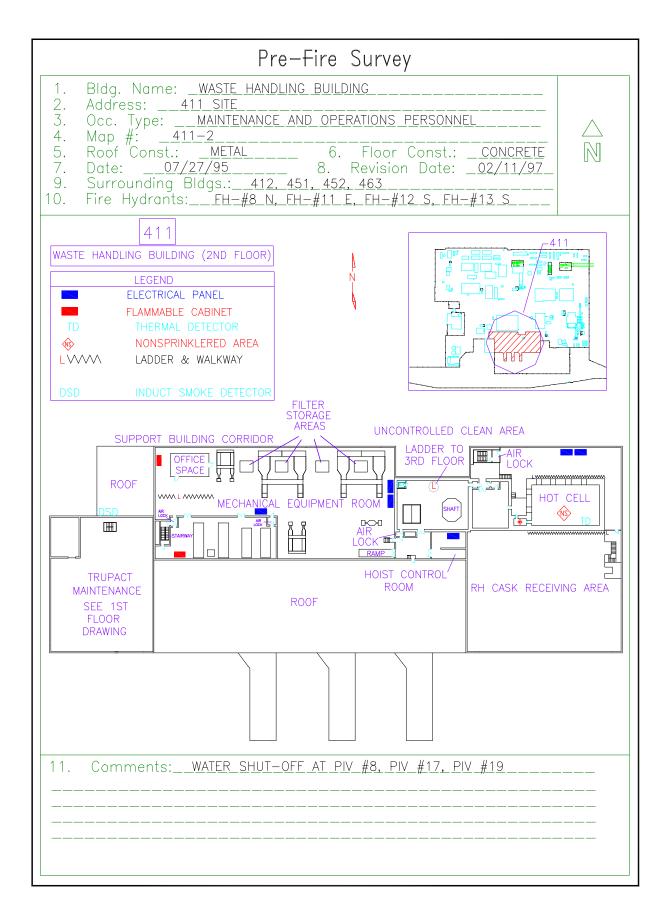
Waste Handling Building Pre-Fire Survey (Second Floor)
